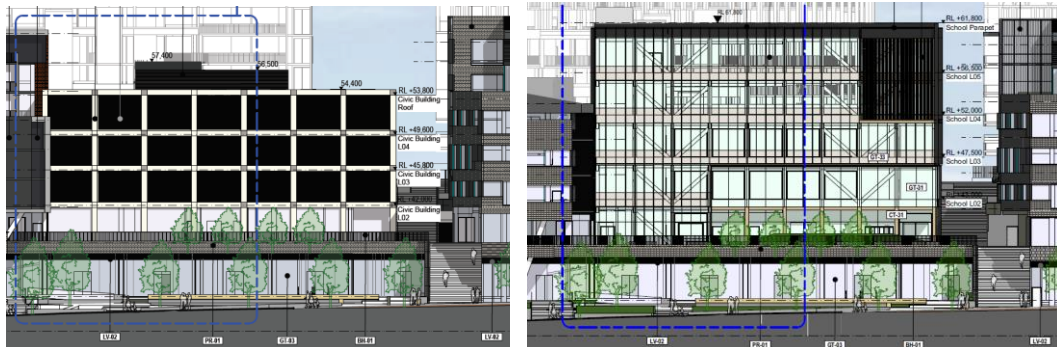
Civil Building proposed amendment (left) and current amendment (right)
